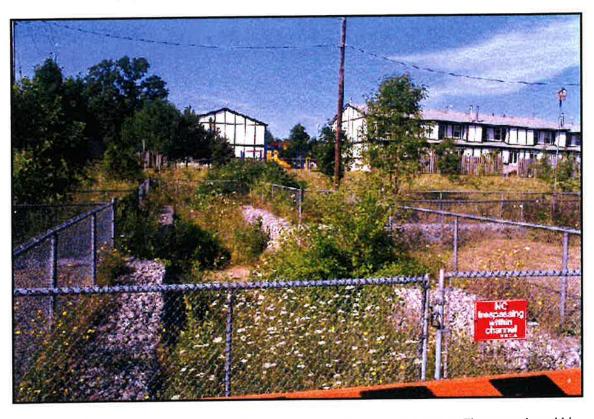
Looking downstream towards Glenwood School Drive from station 0+100 adjacent to Brenda Crescent.
